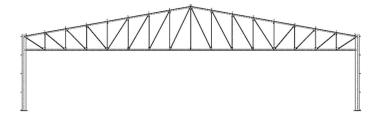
Geometry of the selected truss-girders on columns (University of Navarra, 2010).
